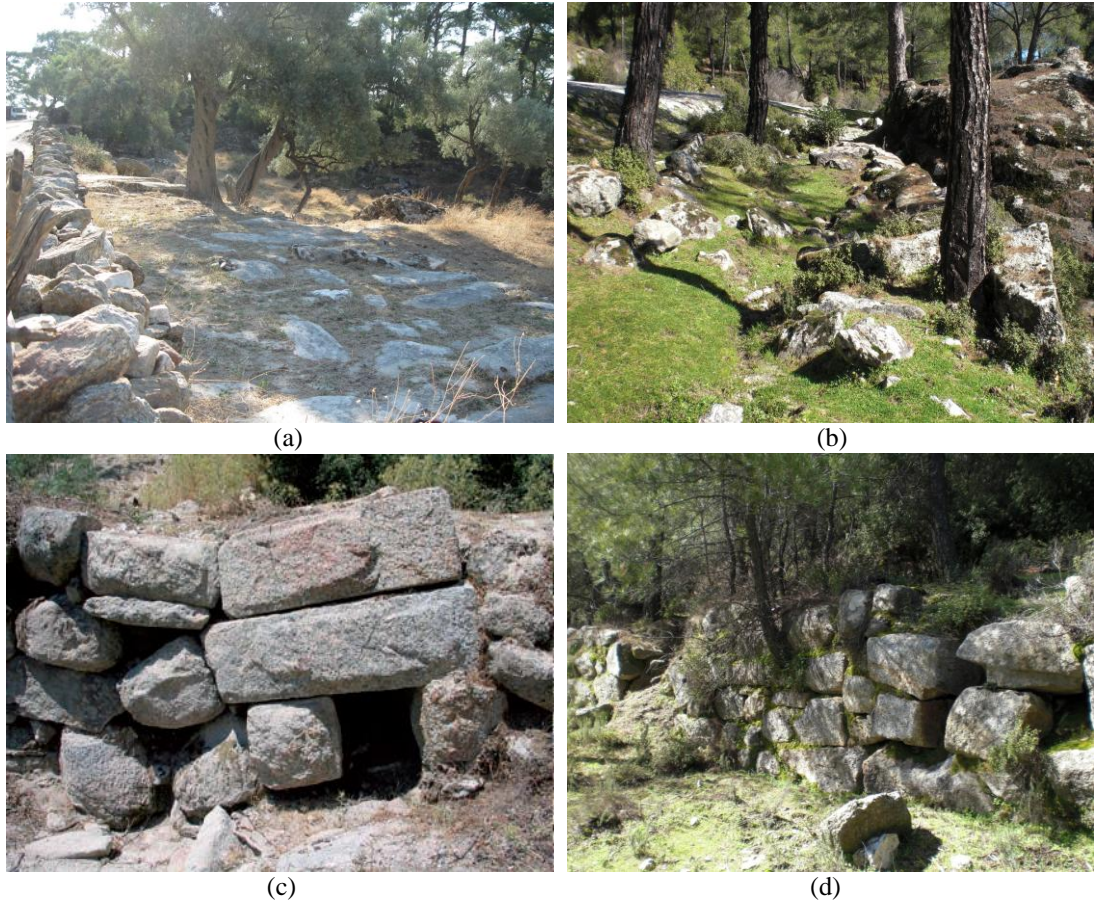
(a) Remaining parts of the road between Milas and Labraunda (Personal Archive) (b) Remaining parts of the road between Milas and Labraunda (Muğla Conservation Council Archive) (c) Drainage channel (Baran, 2011) (d) Retaining wall (Muğla Conservation Council Archive)
